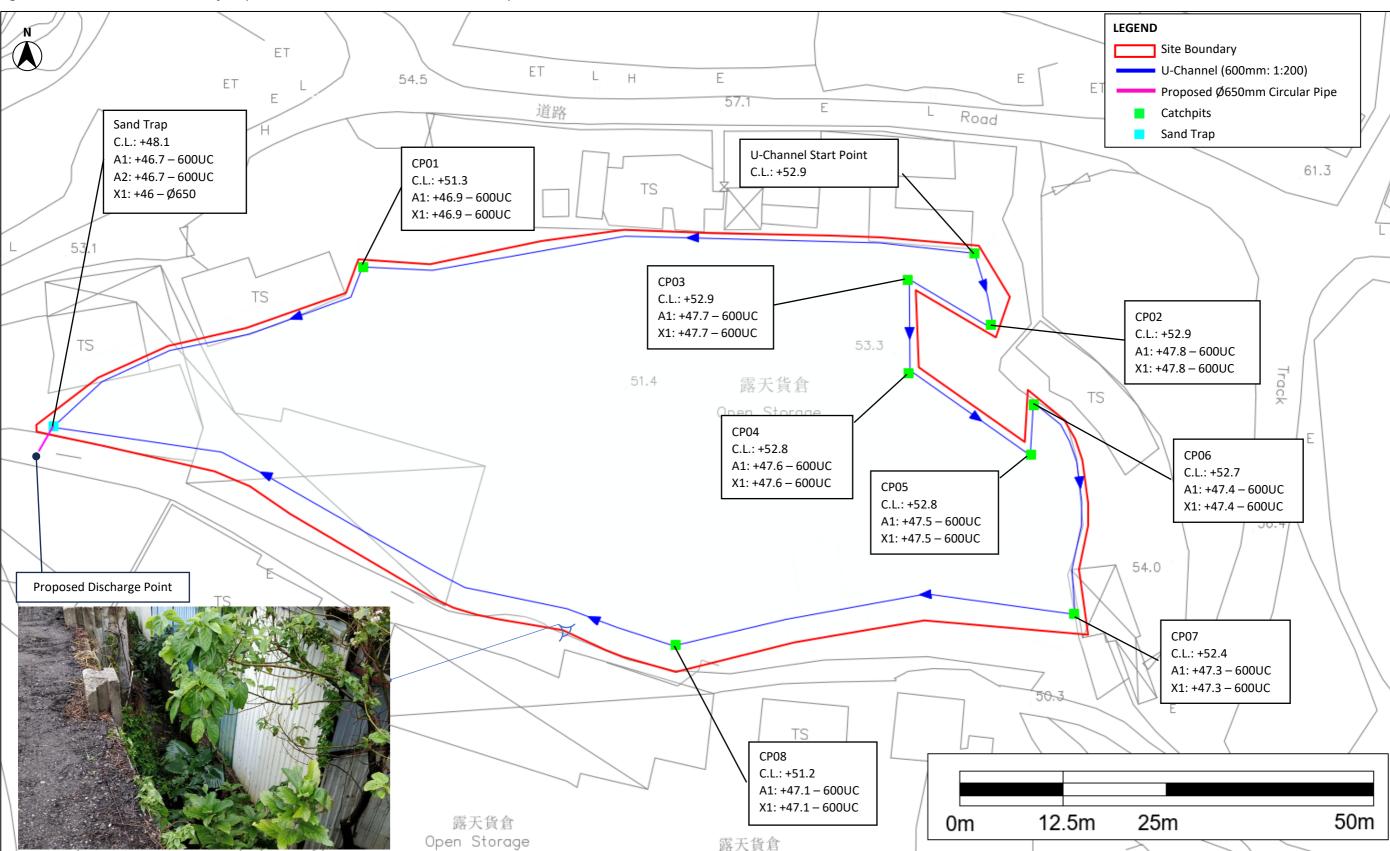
Indicative Location of Proposed Terminal Manhole and Stormwater Pipe
